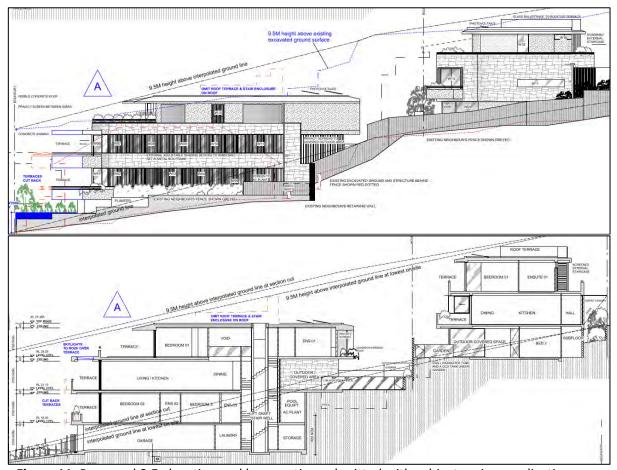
Proposed S-E elevation and long section submitted with subject review application
